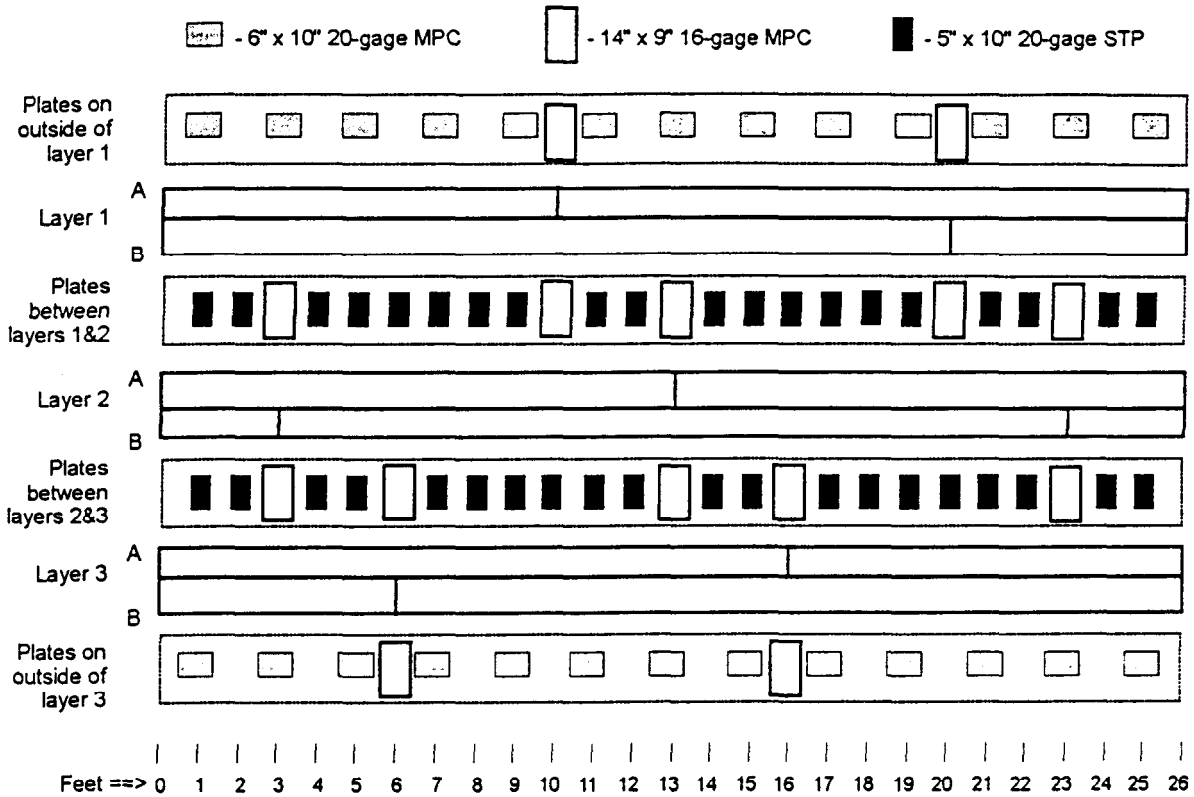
Metal plate connectors location in nail-laminated girders. Same pattern both sides.
